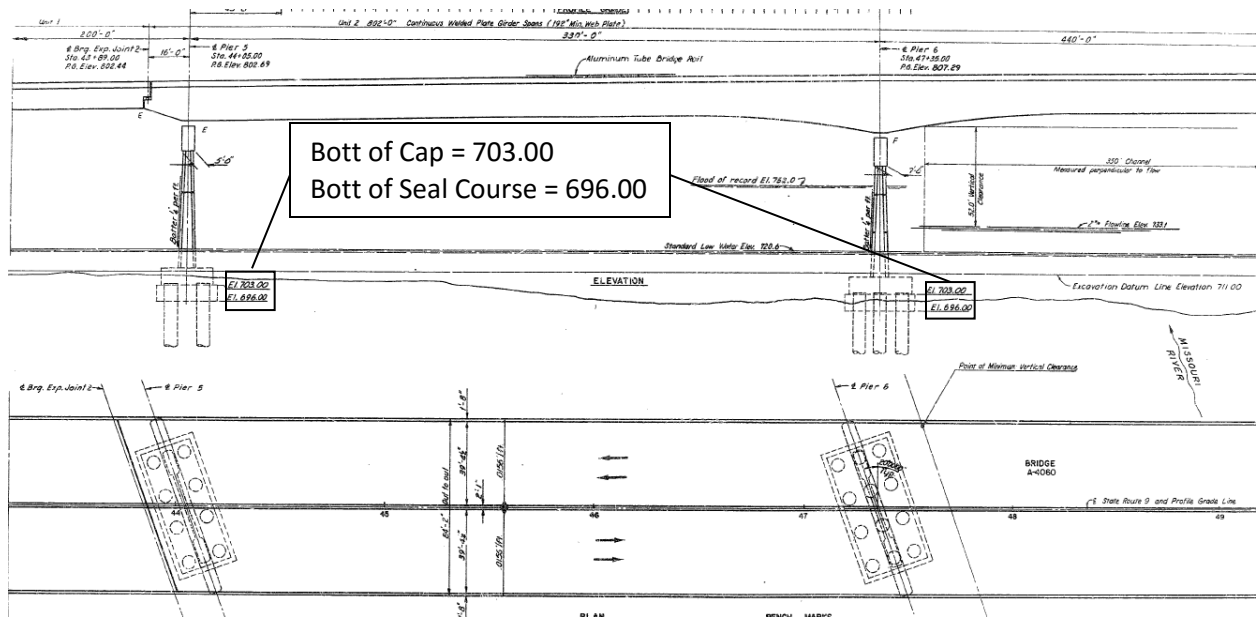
As-Built Substructure Plans, MO Hwy 9 Bridge
